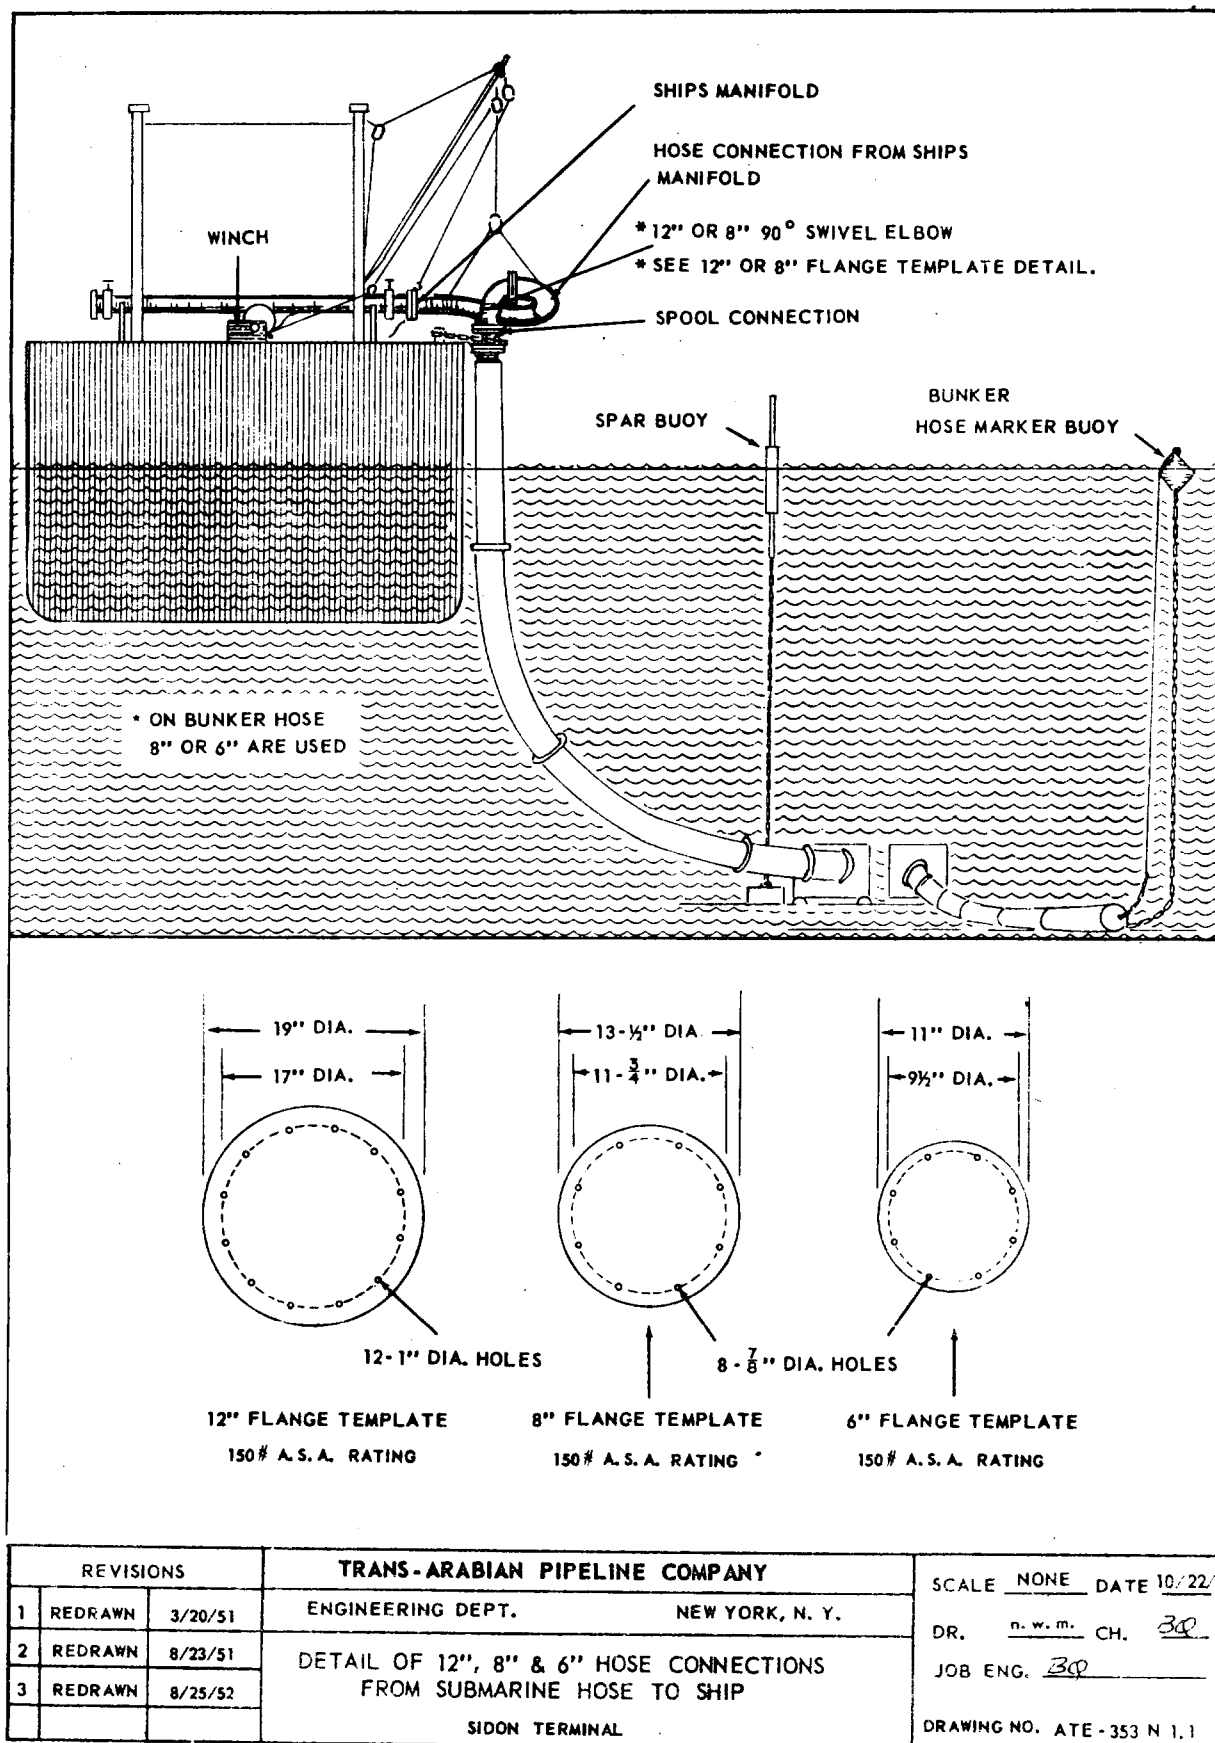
DETAIL OF 12', 8' & 6' HOSE CONNECTIONS
